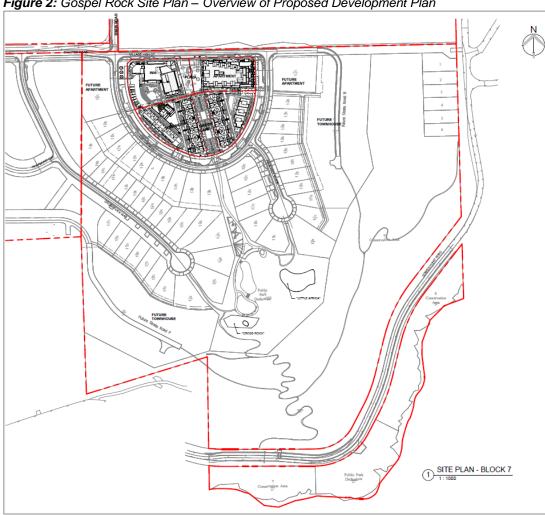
Gospel Rock Site Plan - Overview of Proposed Development Plan
